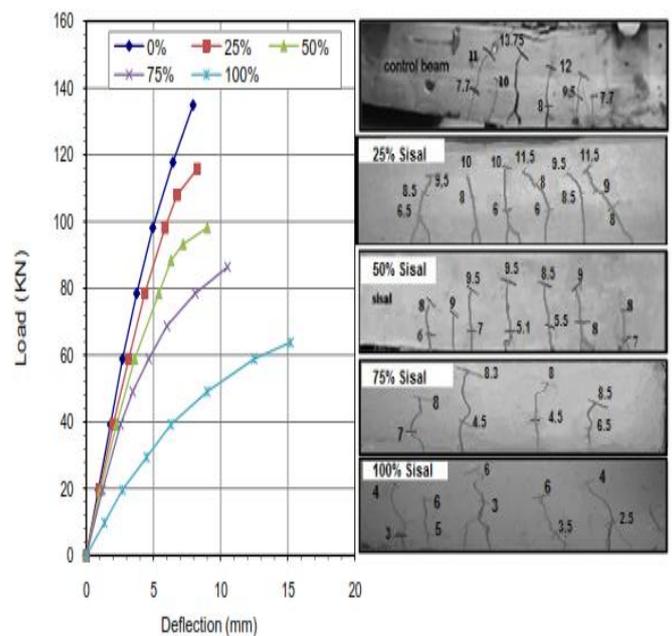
Load-deflection of beams reinforced with sisal bars and cracking pattern for tested beams
